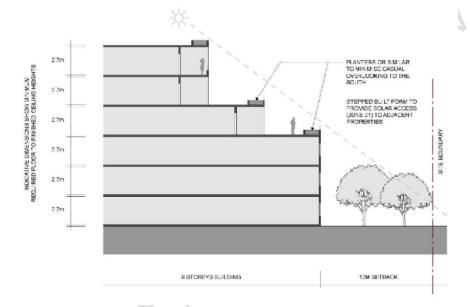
Indicative section at precinct southern boundary, adjoining Jones Street.
